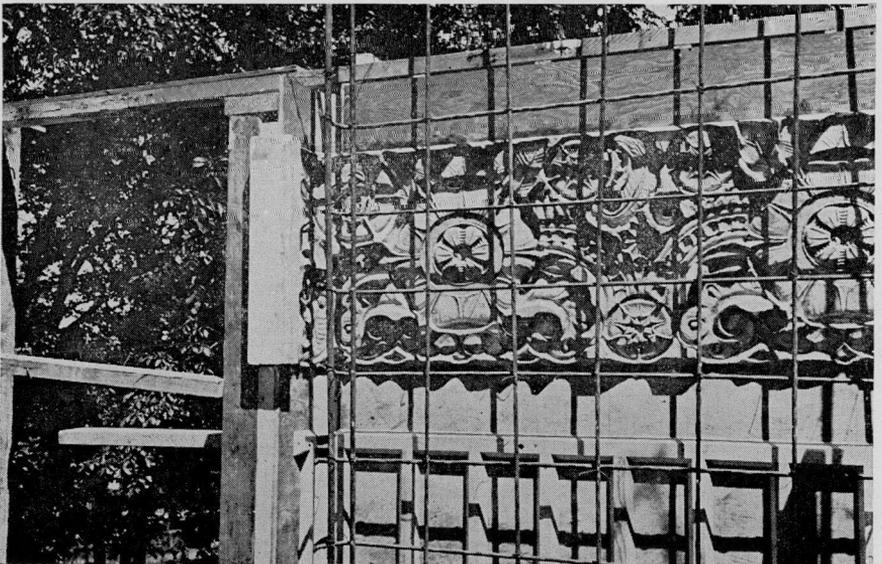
PLASTER WASTE MOLD FOR DECORATIVE DETAIL; WOOD FORM FOR BELT COURSE.
